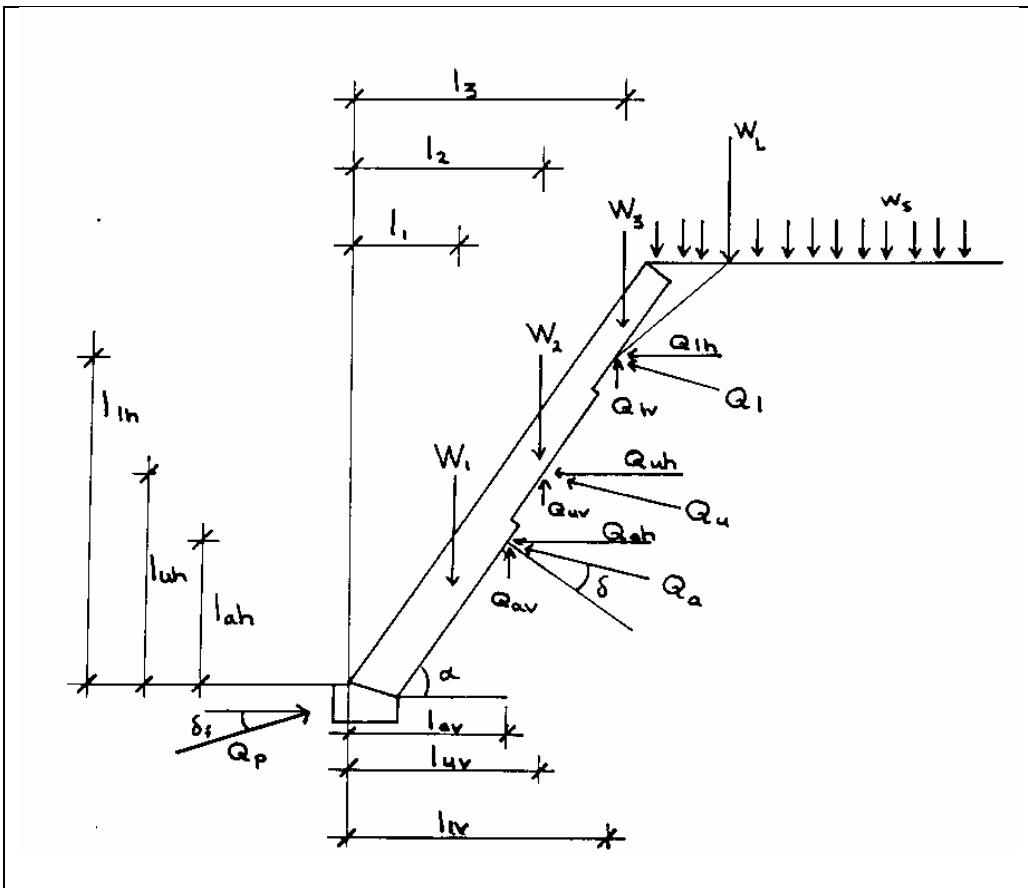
The forces to be considered in analysing a dry stack retaining wall
